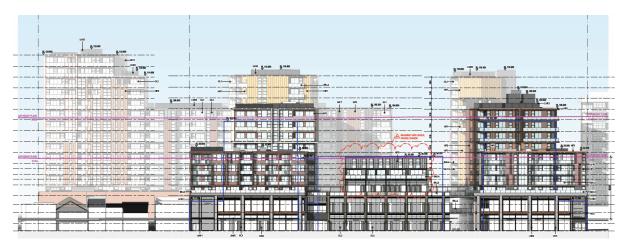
North Elevation (Rowe Street Mall Frontage).
